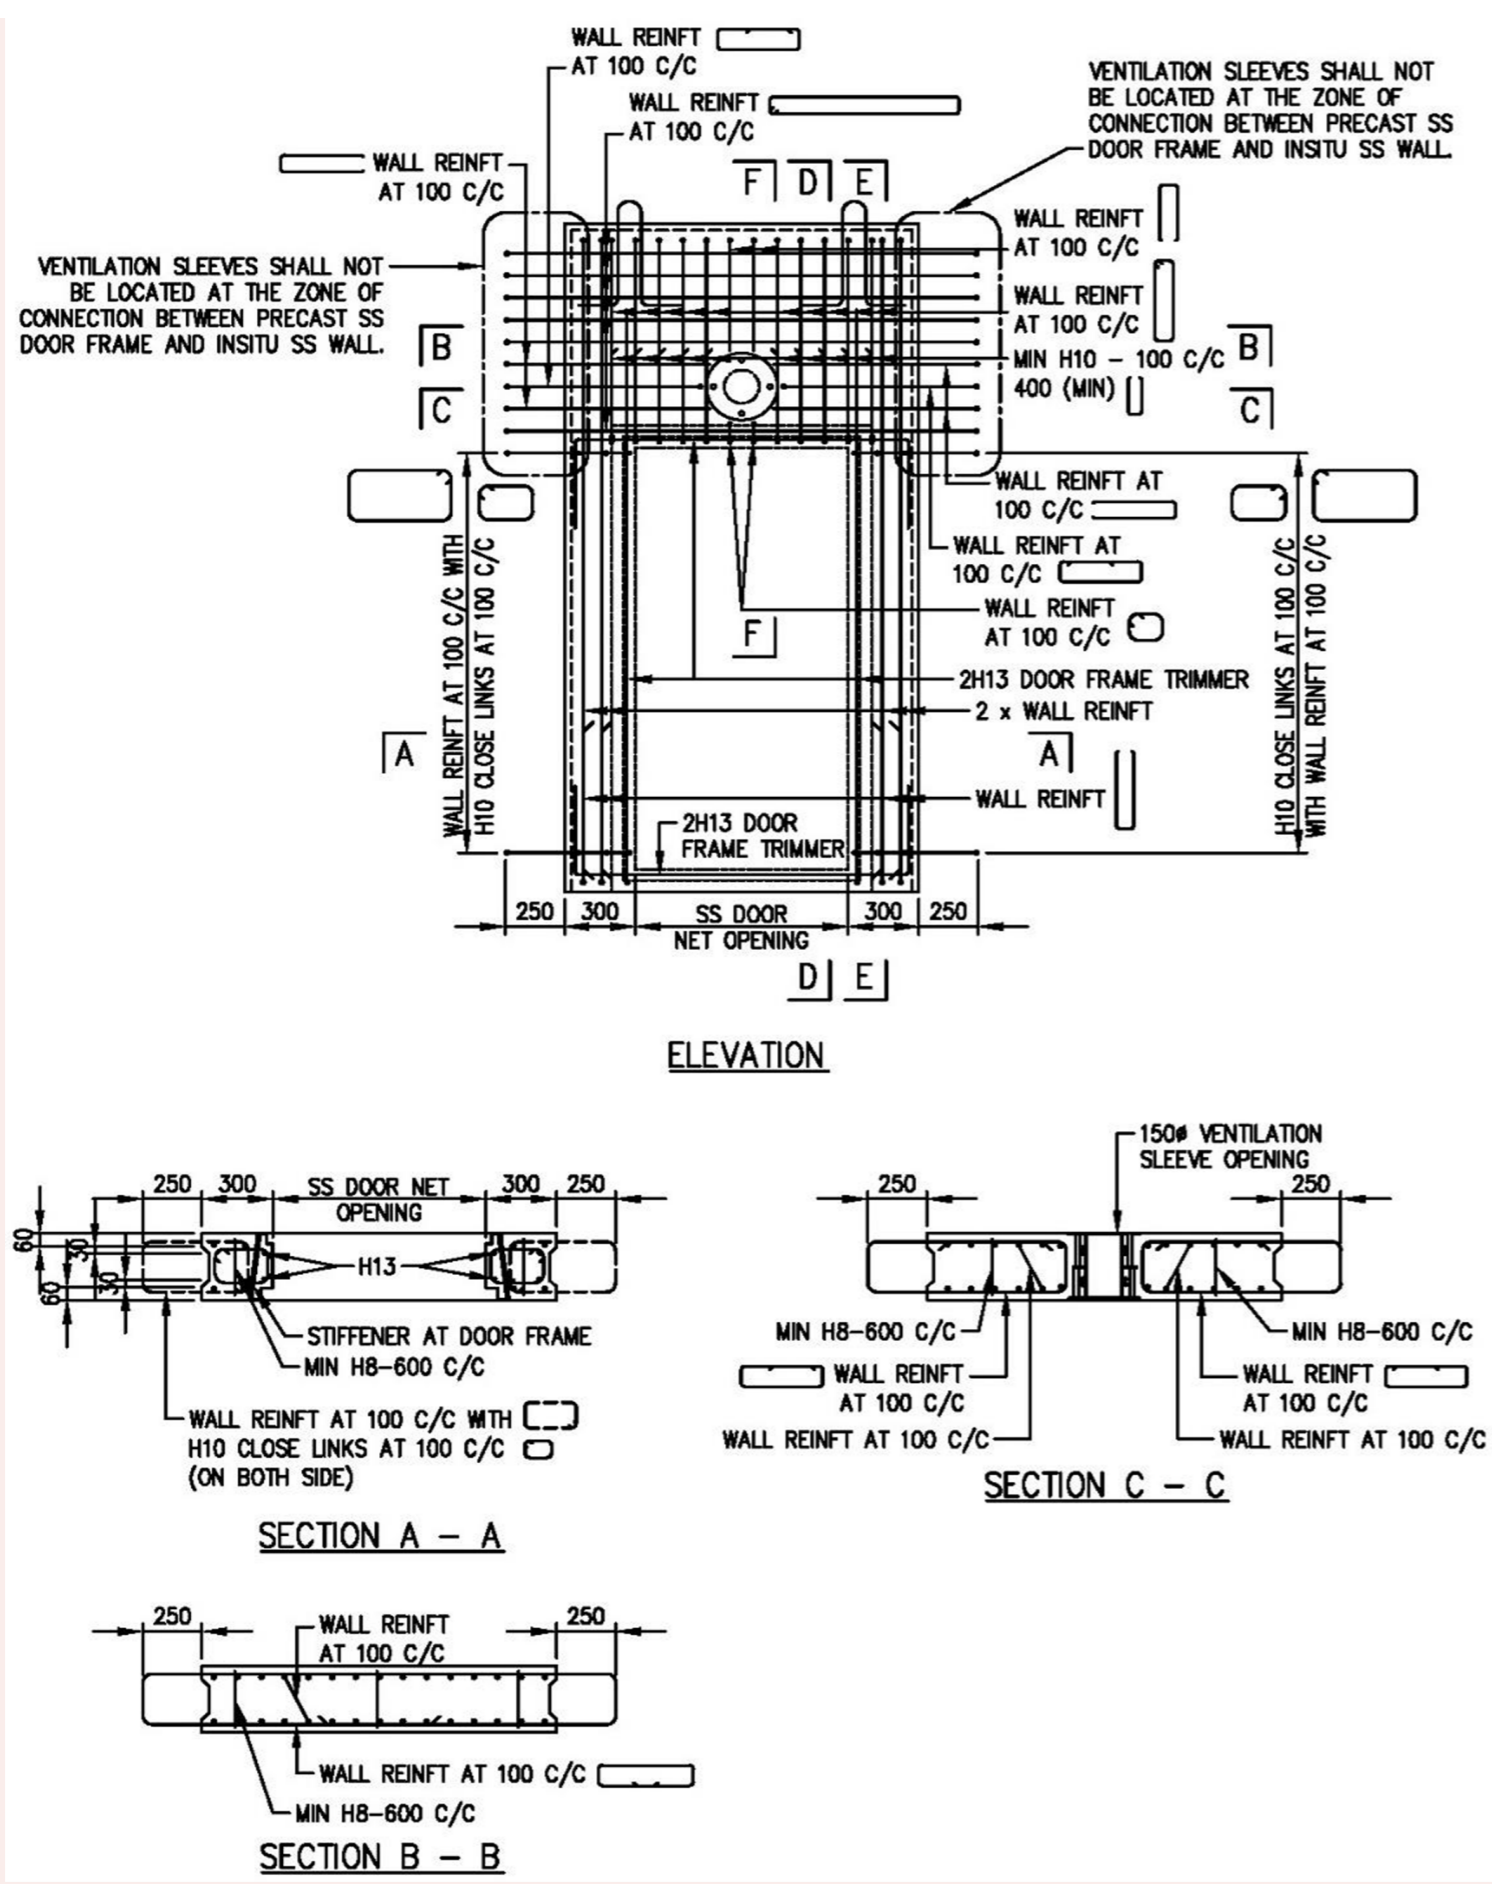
(c): SECTIONS OF PRECAST SS DOOR FRAME PANEL WITH VENTILATION SLEEVE ABOVE IT (TYPE 1)
